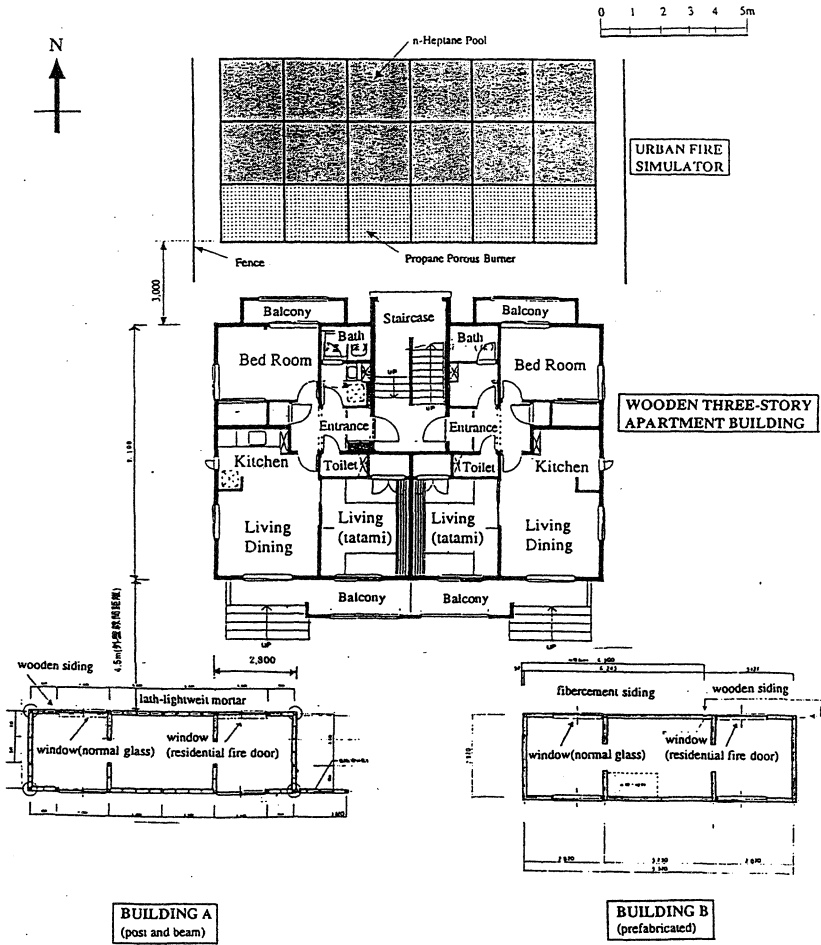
Full-scale wooden three-storey apartment building fire test in city fire scenario, Experimental arrangement
